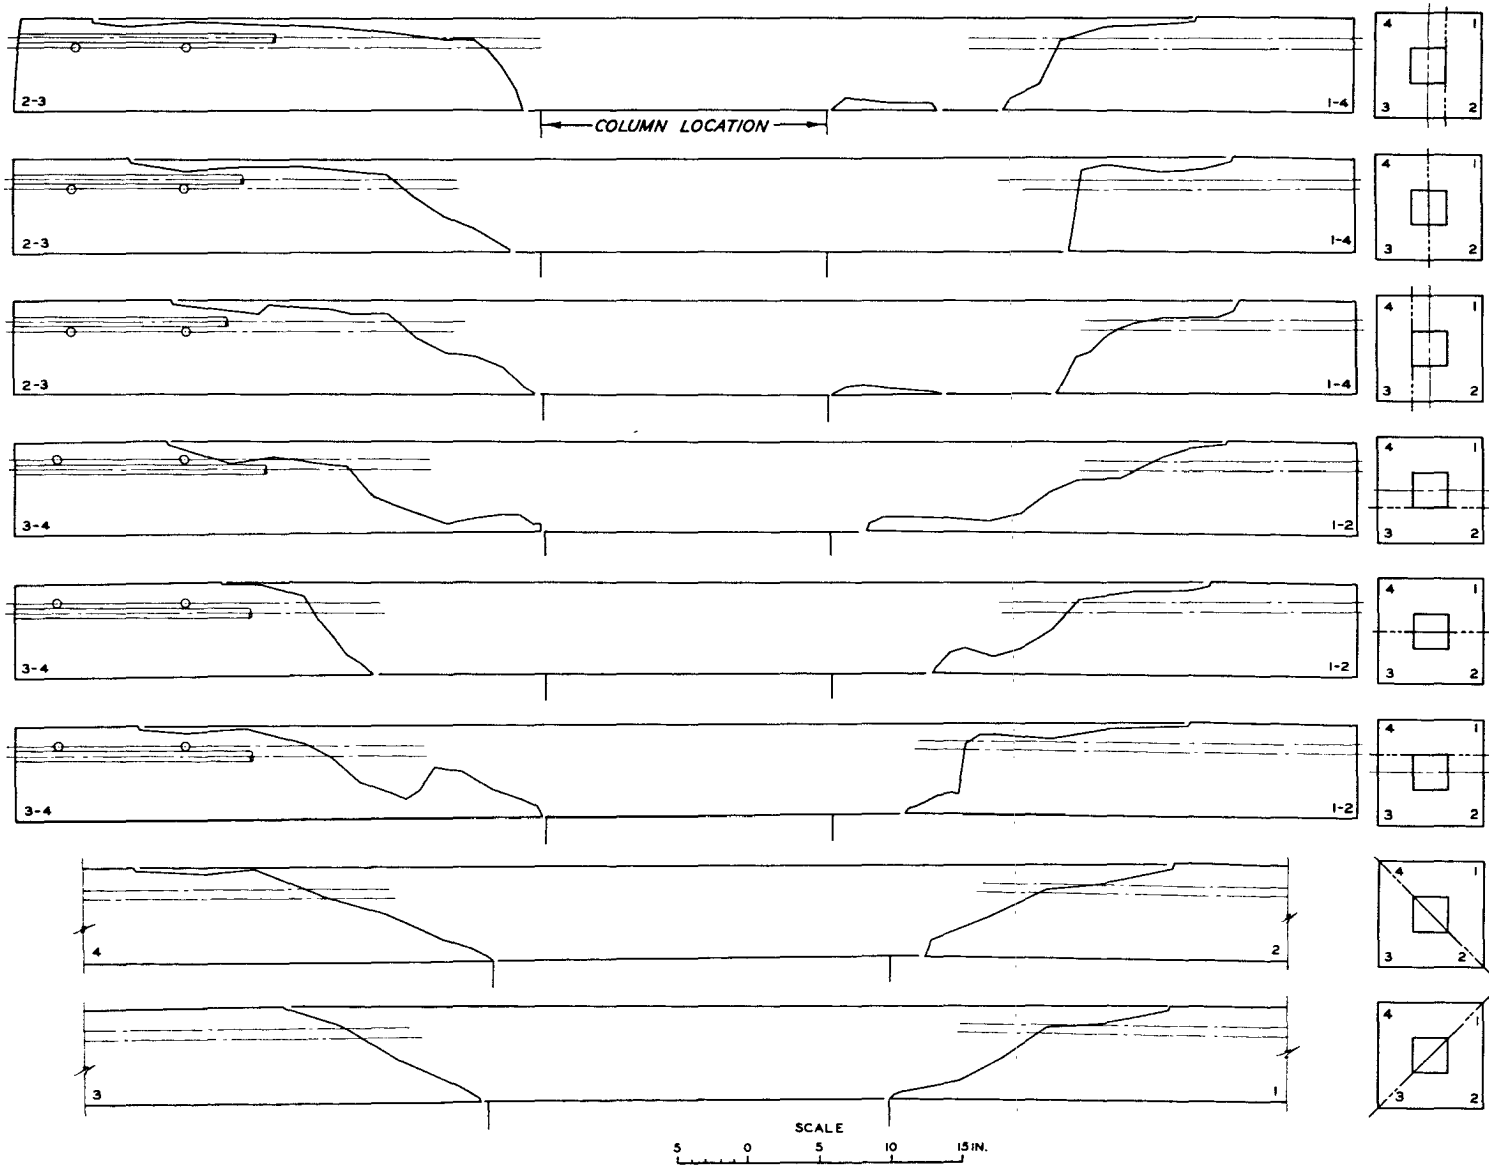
Profiles of slab failure surface, Specimen D4075-2.
